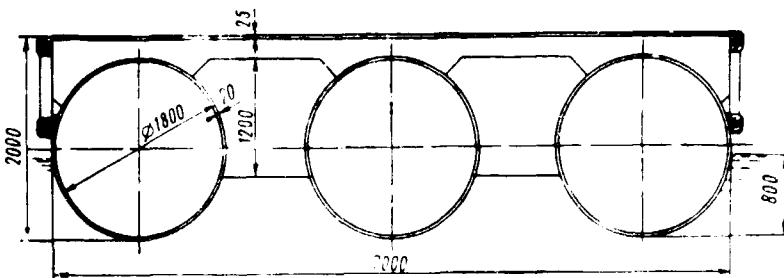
Cross section of Reinforced concrete hull of a platform of shell-type design.
